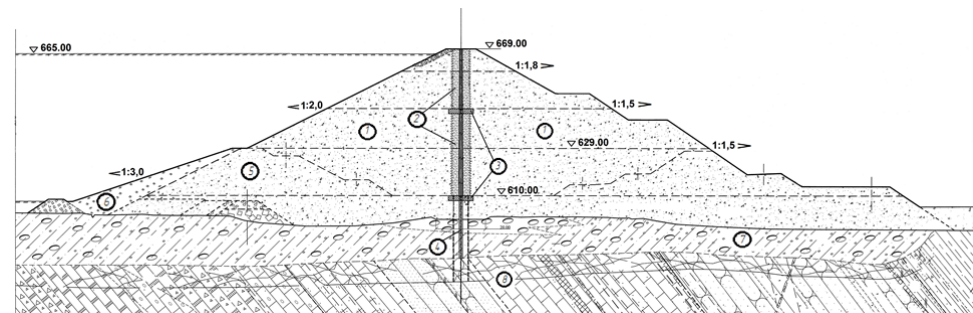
Design cross section of Gotsatlinskaya HPP embankment dam: 1 — downstream and upstream shells; 2 — stages (layers) of diaphragm construction; 3 — joint of connection between diaphragm layers and foundation (foreshaft); 4 — impervious element; 5 — upstream cofferdam; 6 — impervious screen; 7 — alluvial base; 8 — bedrock base.
